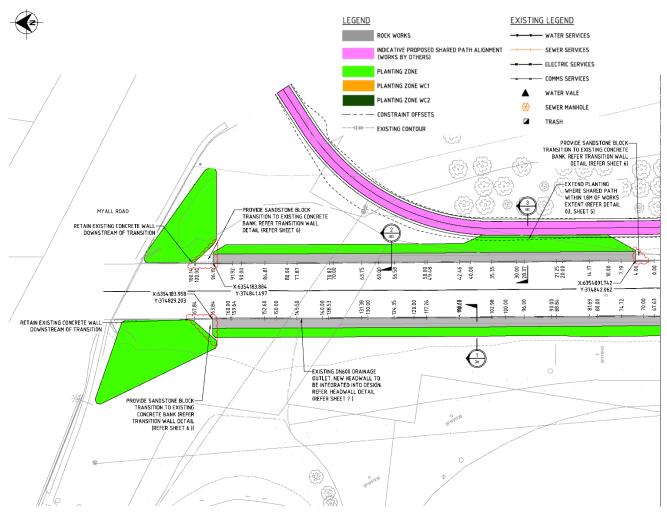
Winding Creek South of Myall Road, Cardiff: Site Overview (1 of 2)
